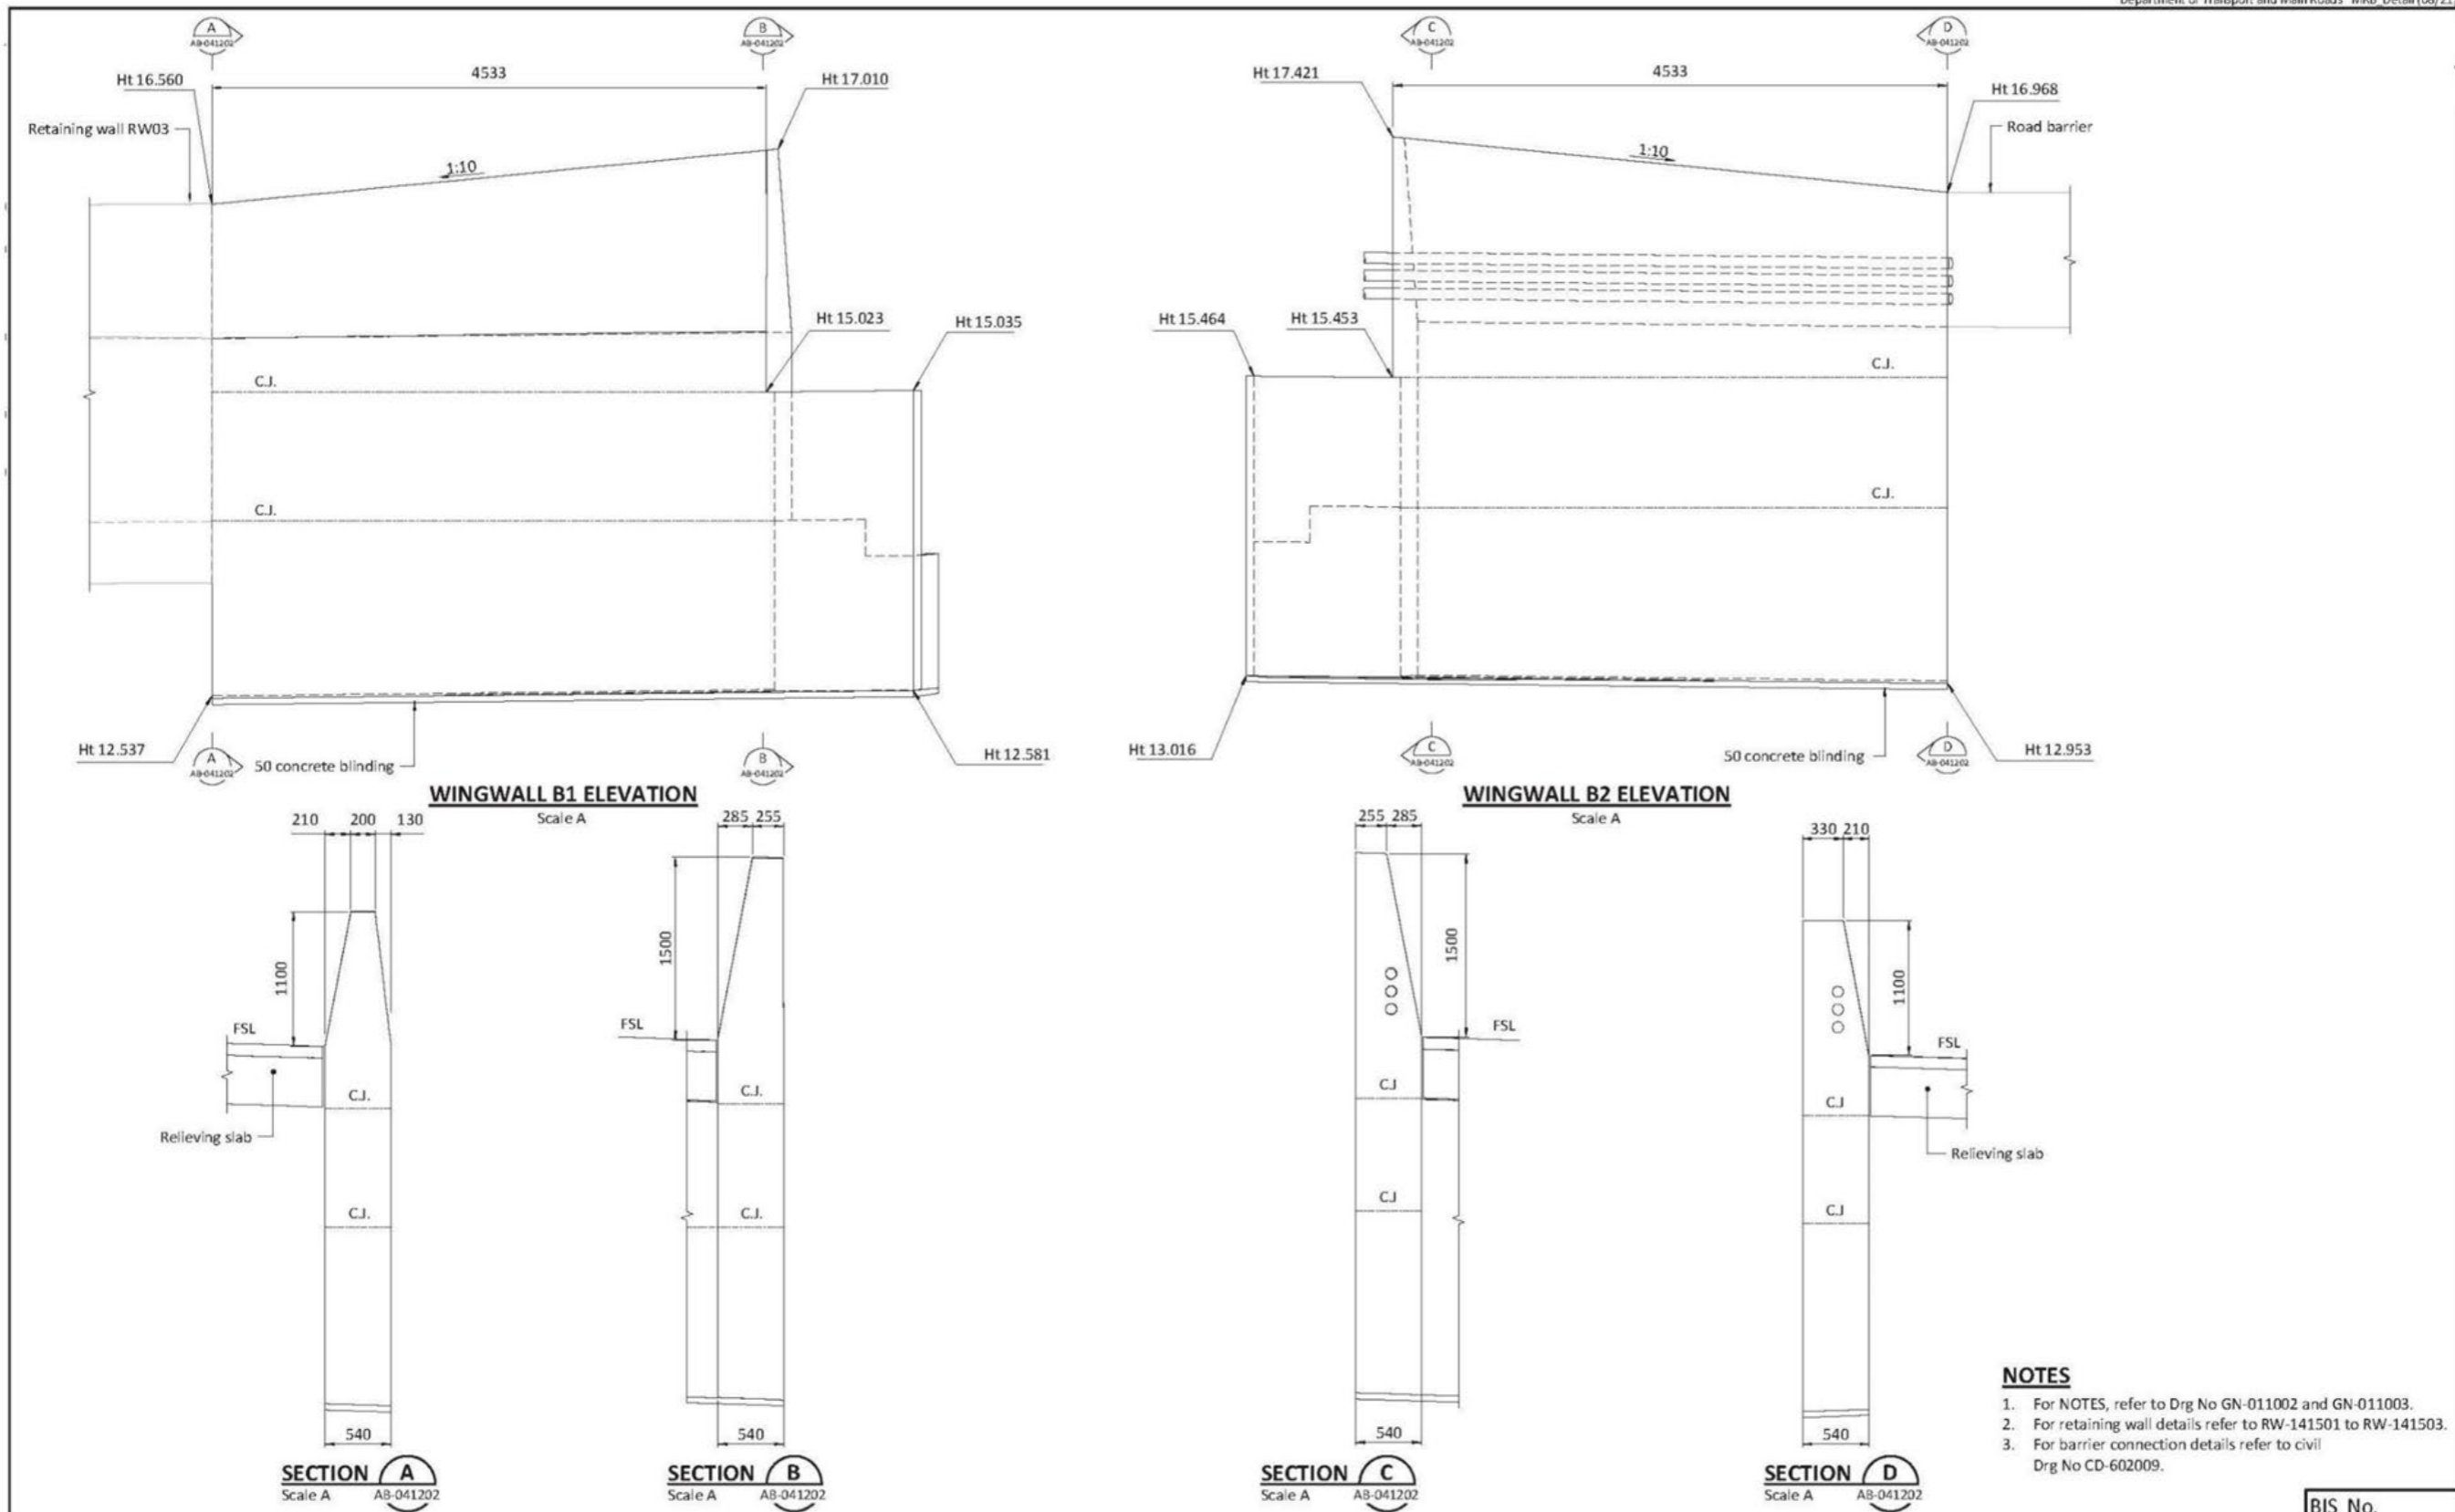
(j) - Example abutment drawings for deck unit skewed bridge - Sheet 1 - concrete plan and elevation
